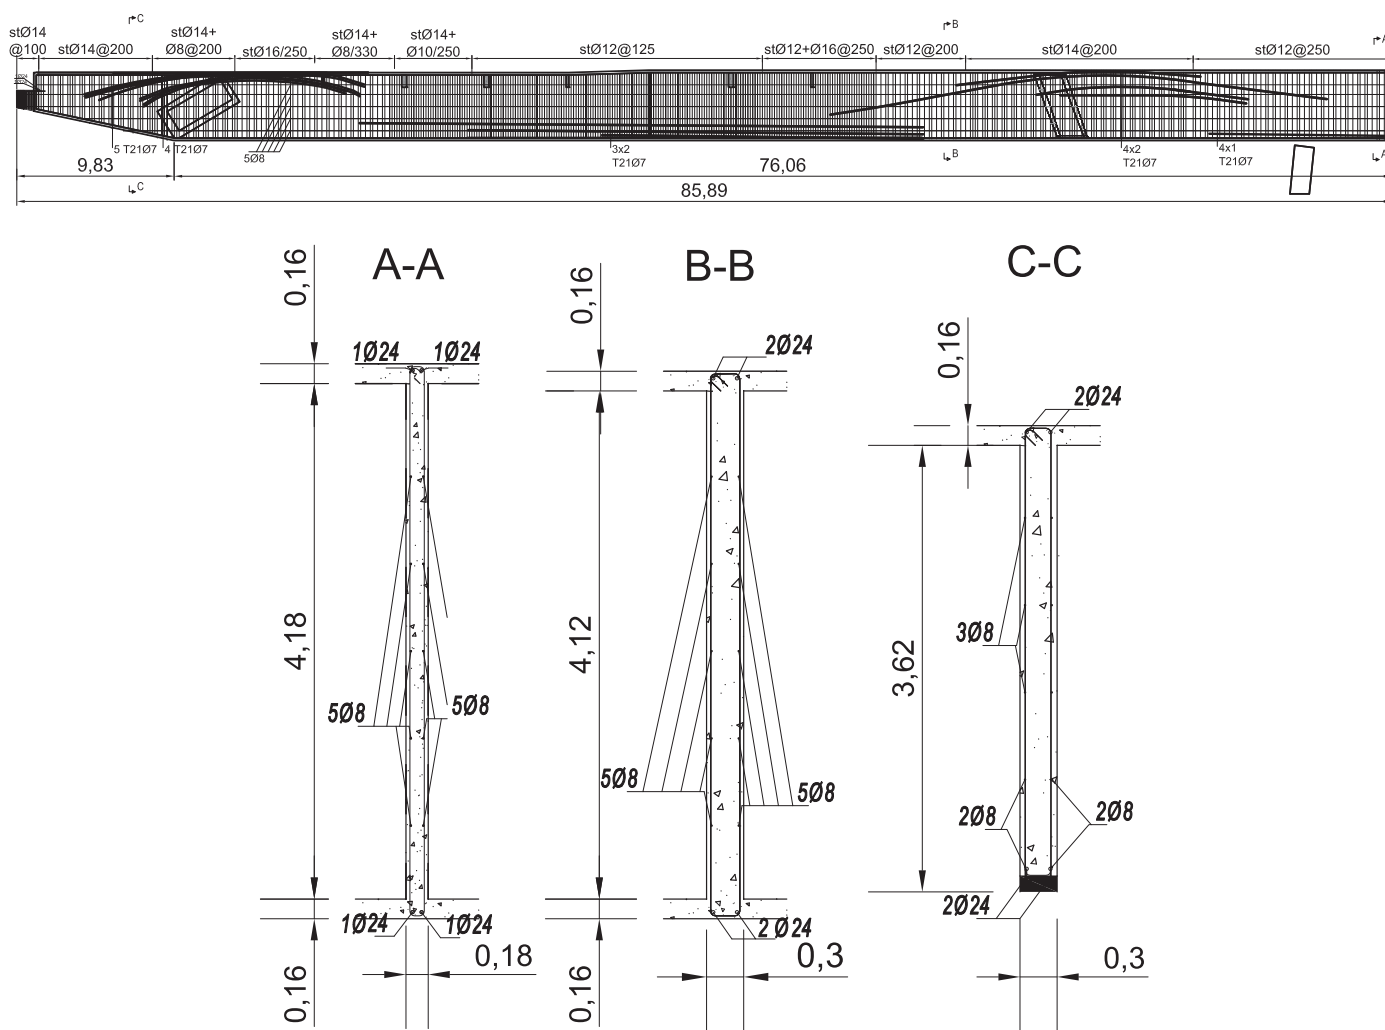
Geometry and reinforcement (top) in addition to three cross-sections (bottom) of the main deck (Units: m)
